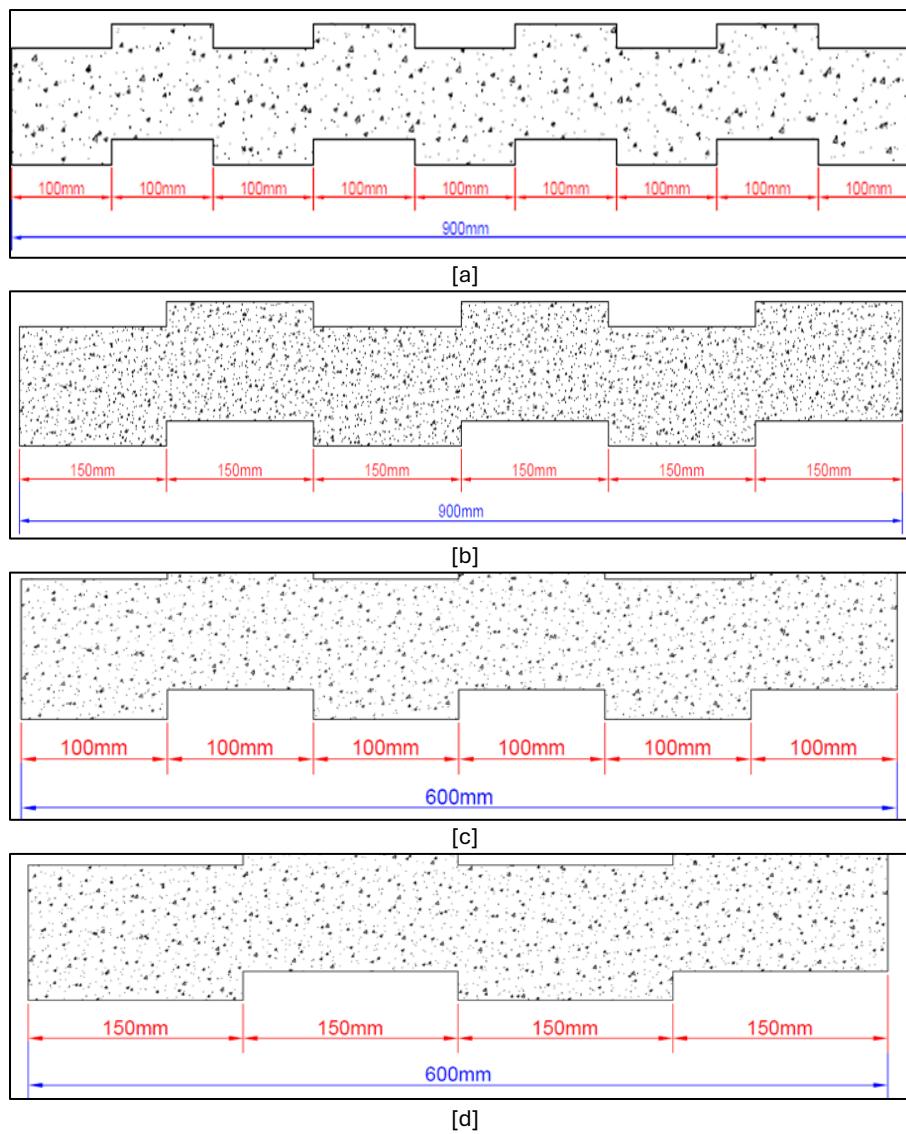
Ribbed sandwich panel specimen [a] Cross-section of the ribbed sandwich panel specimen (R10) [900*900 mm], [b] Cross-section of the ribbed sandwich panel specimen (R15) [900*900 mm], [c] Cross-section of the ribbed sandwich panel specimen (R10) [600*600 mm], [d] Cross-section of the ribbed sandwich panel specimen (R15) [600*600 mm]
